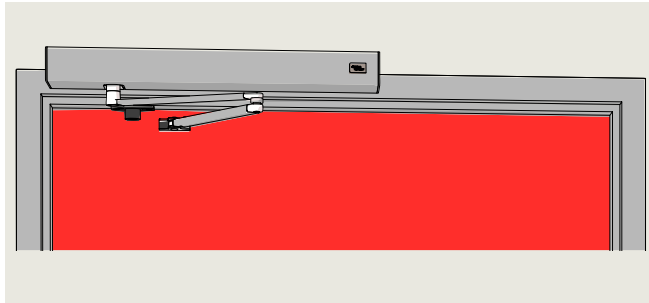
ED900 T – Track mount installation – LH pull
